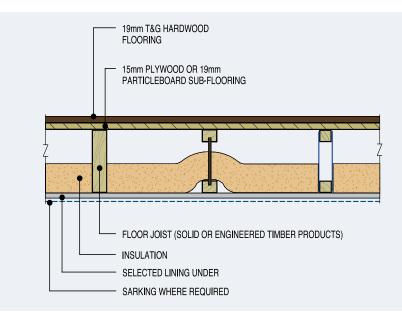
19 mm T&G Hardwood flooring or particleboard to top of joists
